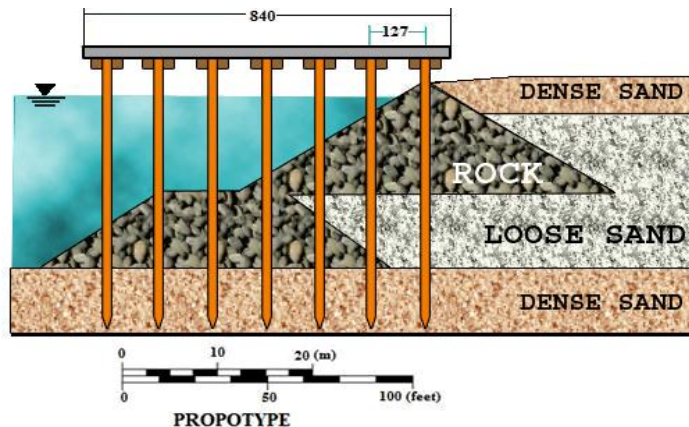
Cross section profile of wharf structure showing structural elements and soil layers
